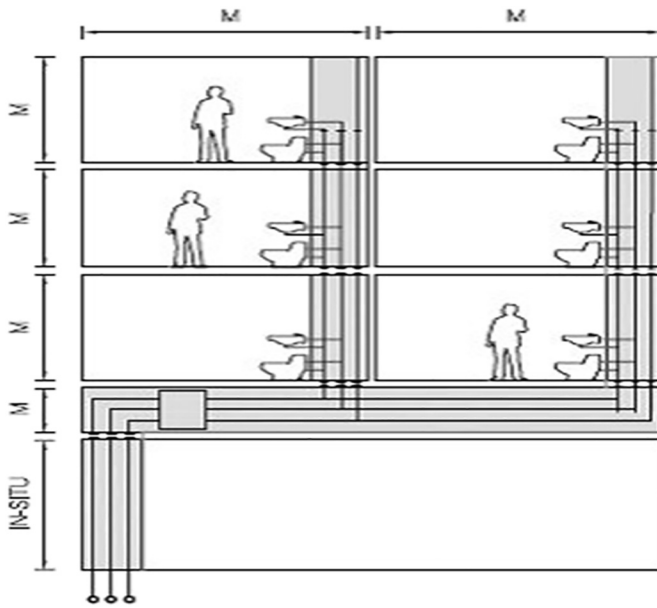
Mechanical, electrical, and plumbing (MEP) connection between vertically aligned modules [16].
